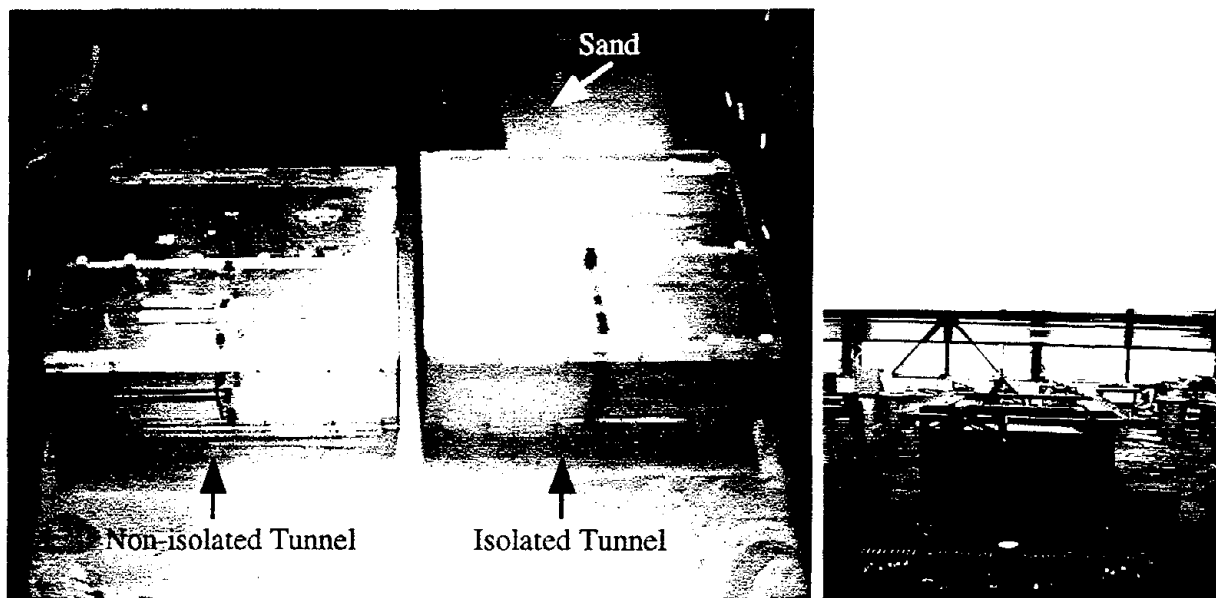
Arrangement of tunnel models (left) and a general view of the vibration test (right)
